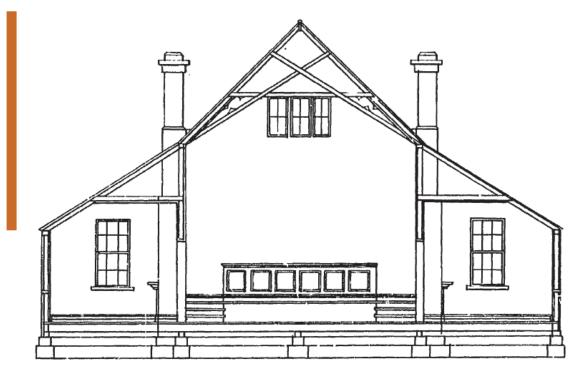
Section through Clarence Town Courthouse, showing some of the internal details, including magistrate's bench, skirting, fireplace surround and decorated timber purlins (Source: Department of Finance, Services and Innovation, Record Number PC129_2)
